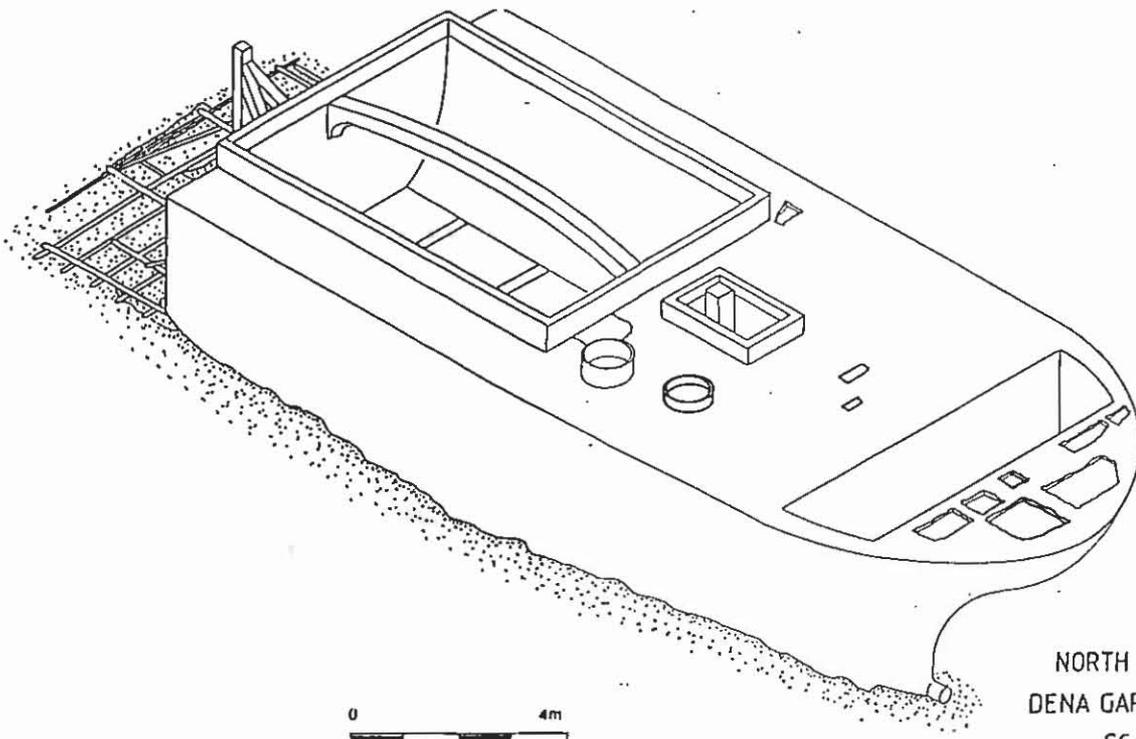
Deck and Interior Plan, North Mole Dredge.
